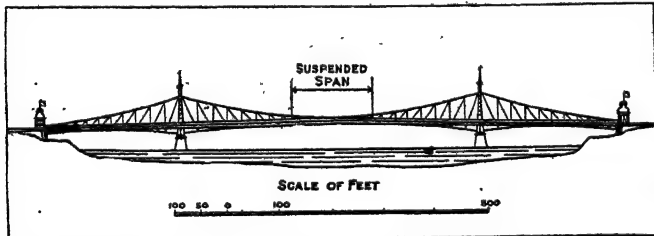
CANTILEVER SPANS IN THE BRIDGE AT BUDAPEST. THE MAIN SPAN, 574 FT. LONG, IS MADE UP OF TWO CANTILEVERS, EACH OF 210 FT. AND A SUSPENDED SPAN OF 154 FEET
